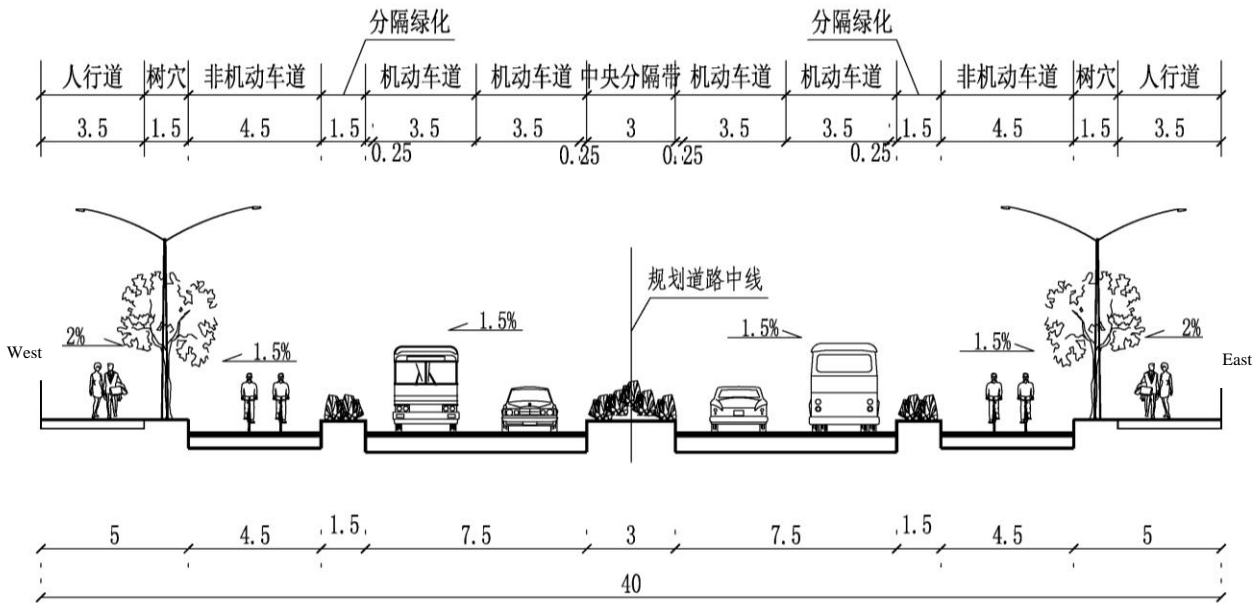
Standard Cross-Section of Zhanqian Road (Connecting Line of Three Bridges ~ Anjing Line)
